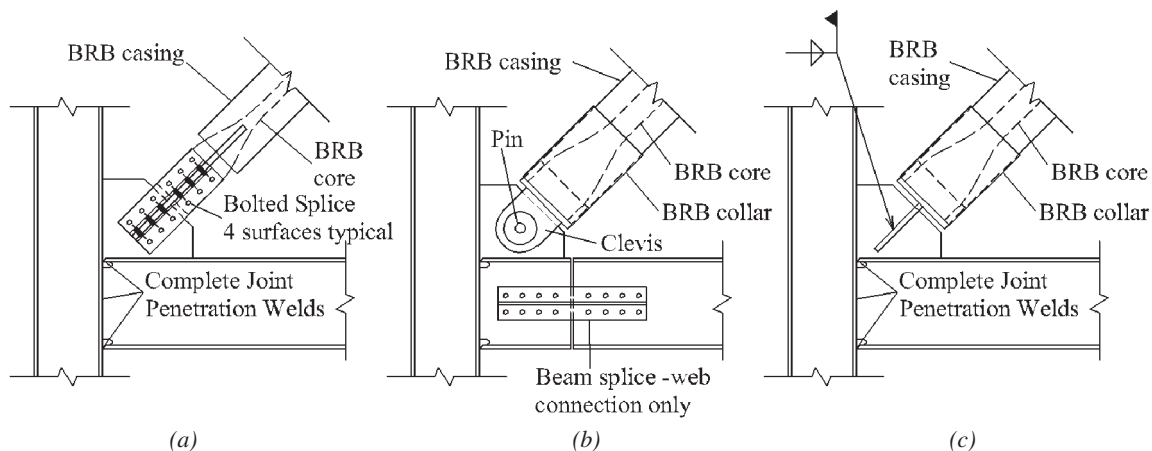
BRB connection types: (a) bolted BRB, fixed beam; (b) pinned BRB, pinned beam; (c) welded BRB, fixed beam.
